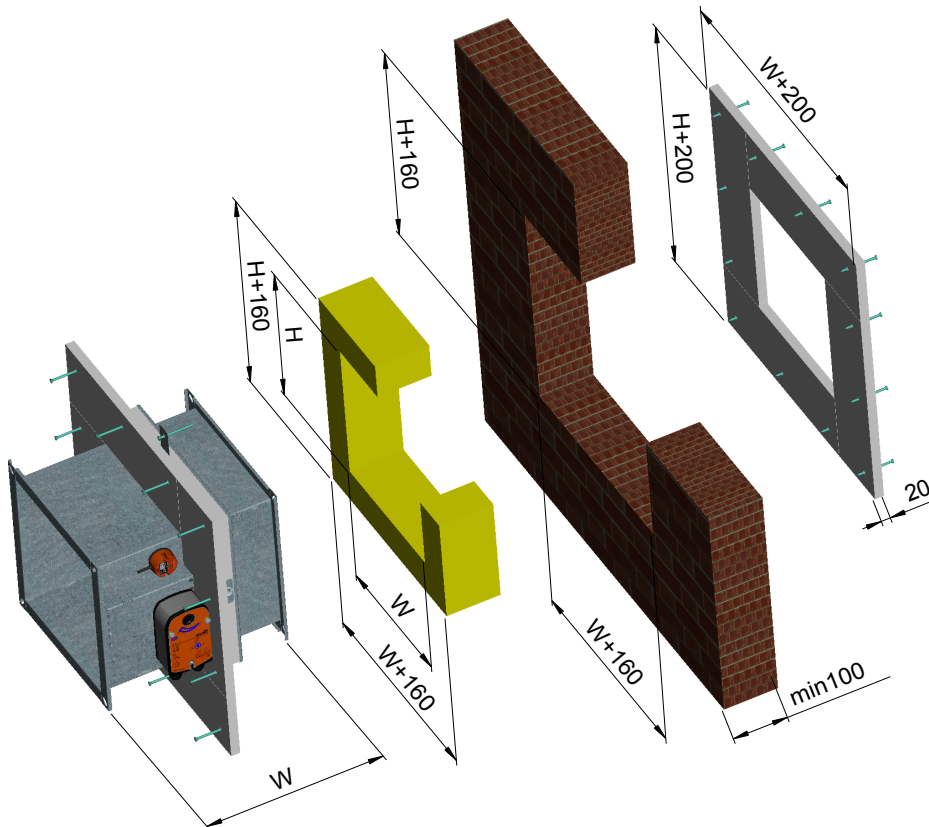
Installation of square fire damper with gypsum mixture or concrete
